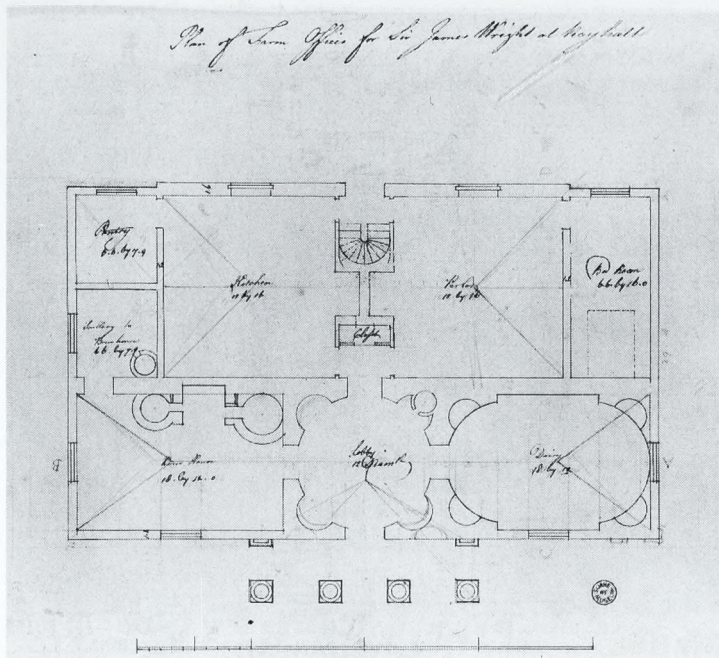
Robert Adam, ground floor plan, proposed 'Farm Offices', Ray Hall, c.1773. *Sir John Soane's Museum.
